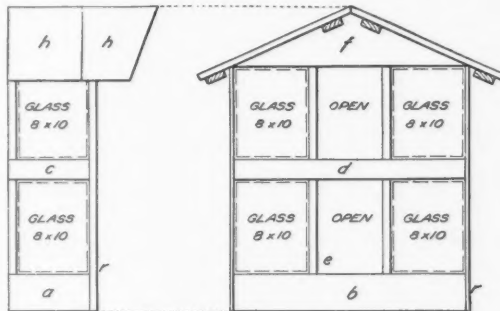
FRONT AND SIDE ELEVATIONS OF SHELTER SHOWN IN FIGURE 1.
